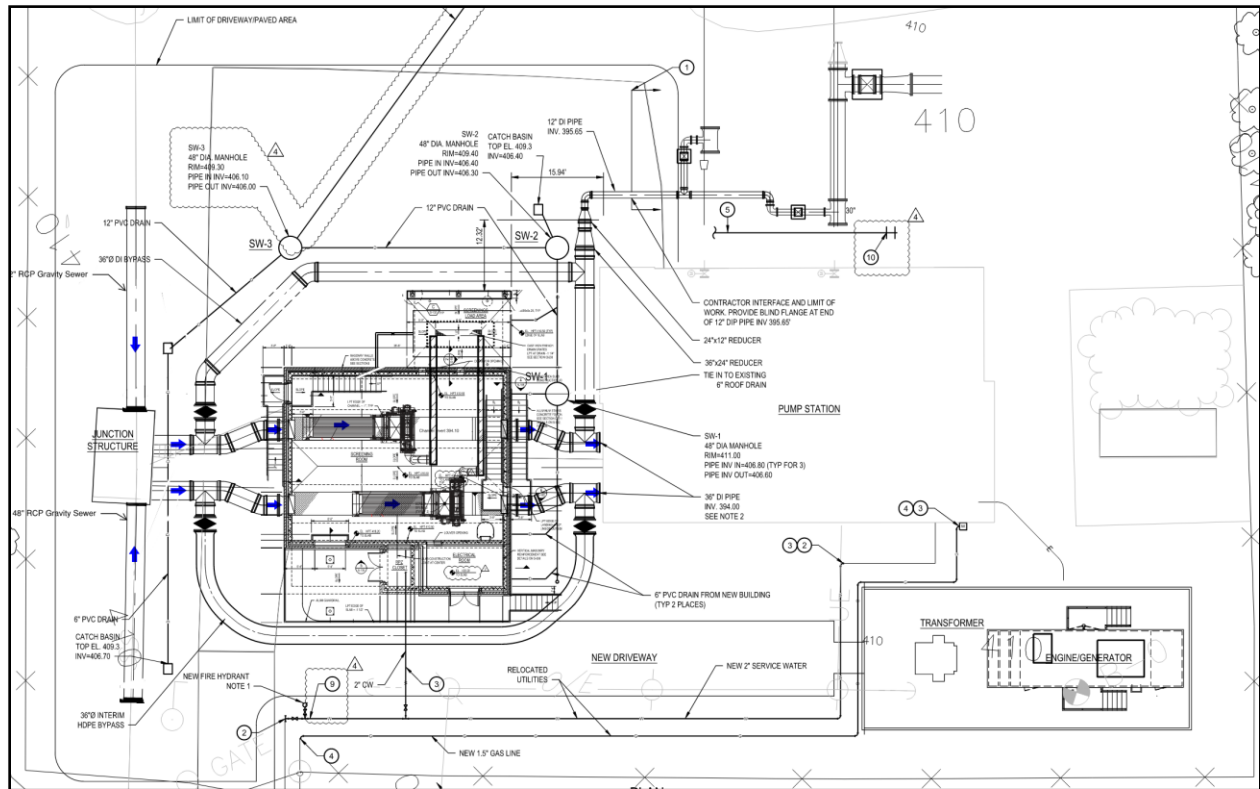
Sanitary Screening Facility – Existing Screening Building and Site
